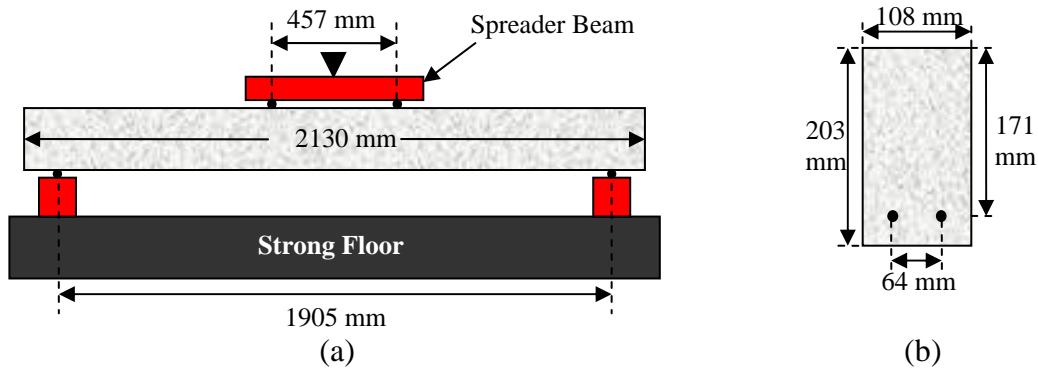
General view of the test specimens (a) elevation and (b) cross-section
